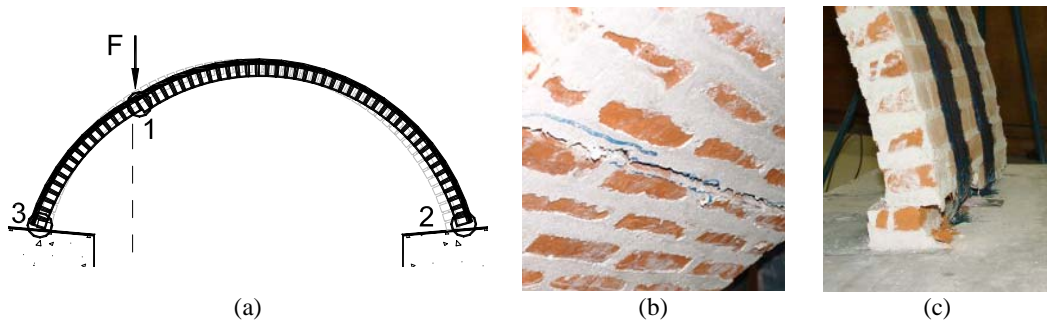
Continuous extrados strengthening: (a) failure mechanism developed; (b) intrados view of hinge 1; (c) sliding along a mortar joint close to the right support.
